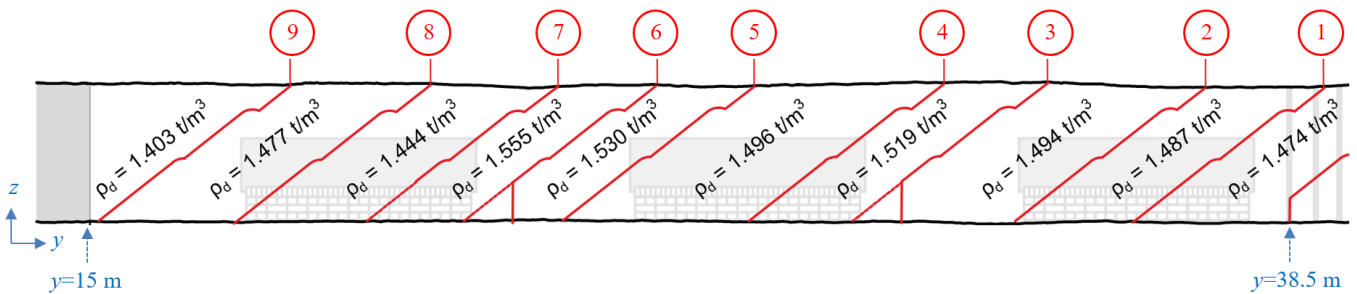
3-D slope scans and bulk dry densities of a longitudinal section of the backfilled FE tunnel (adapted from Lanyon et al., 2020).
